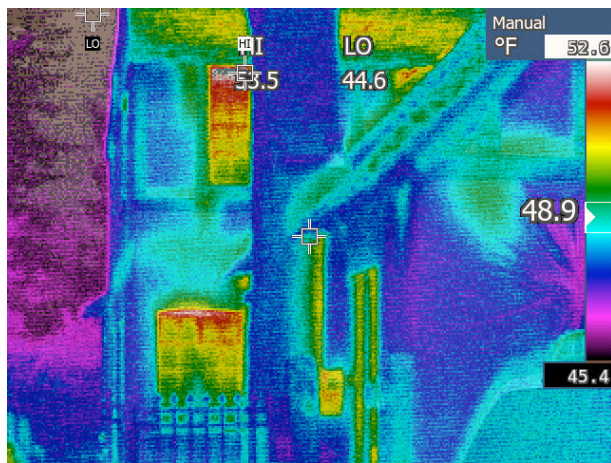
P2 Exterior, missed insulation at rim joists and windows
